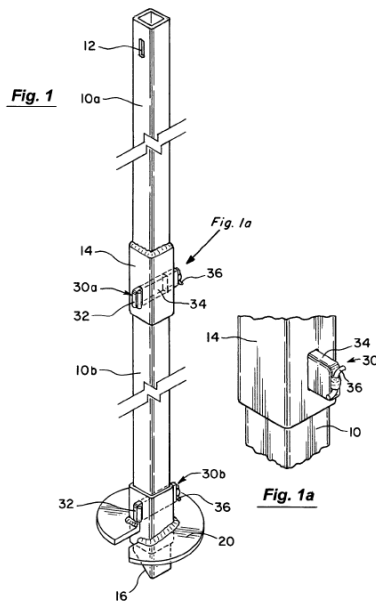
8. Sketches of the modular piles proposed by Jones.
